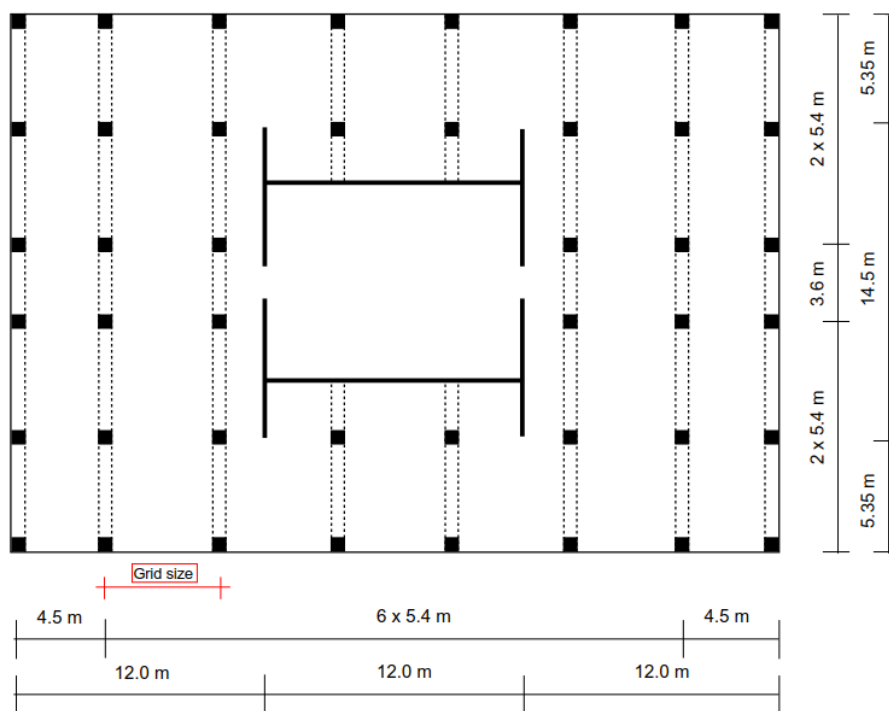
Standard floor plan of alternative design, example with grid size 5.4 m.
